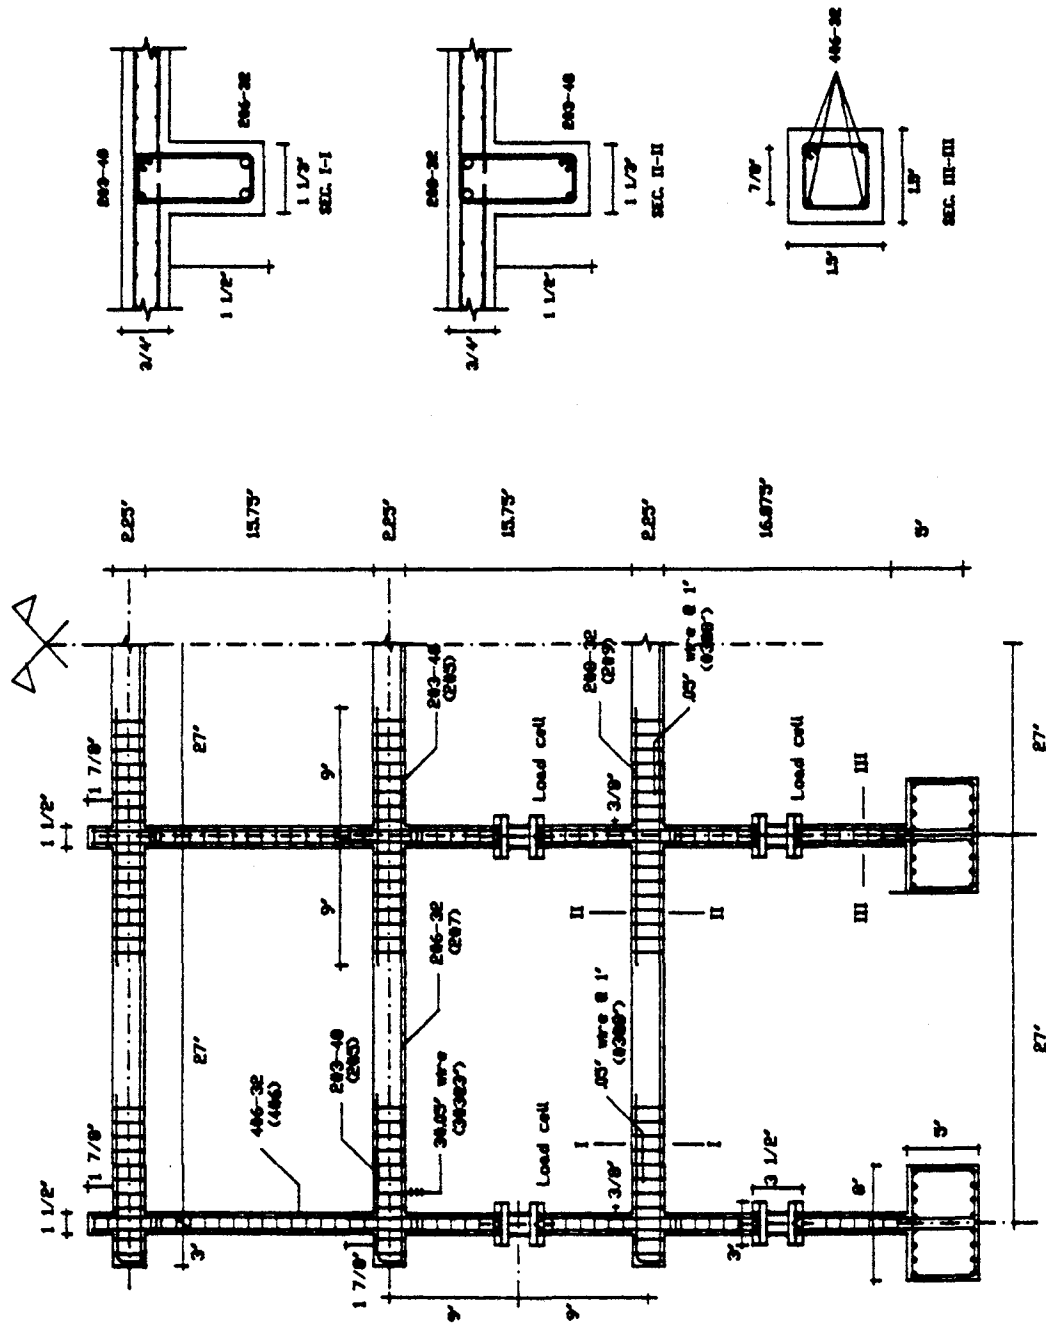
Reinforcement Details of The 3-Story Model (Prototype) Building.
